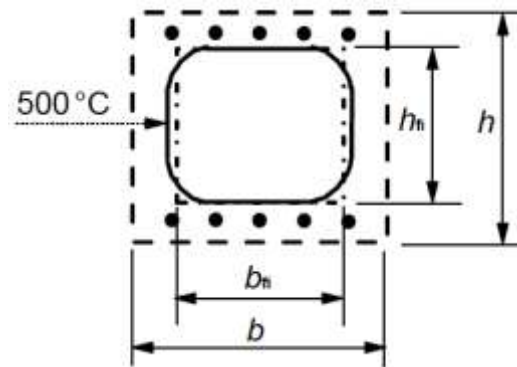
Reduced cross-section of reinforced concrete beam and column, fire exposure on four sides (beam or column) ⁹⁰
